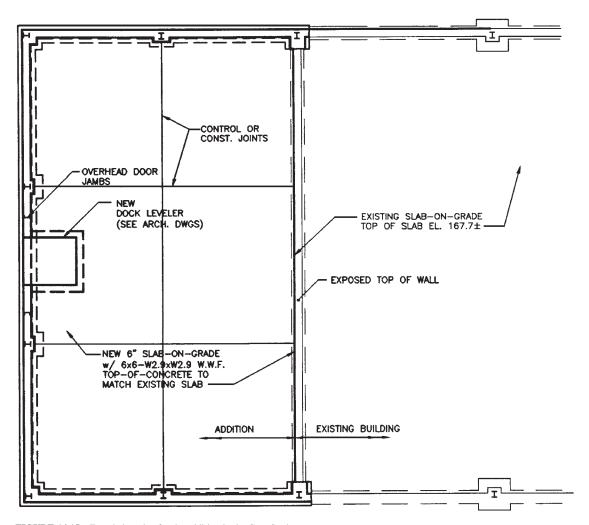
Foundation plan for the addition in the Case Study.
